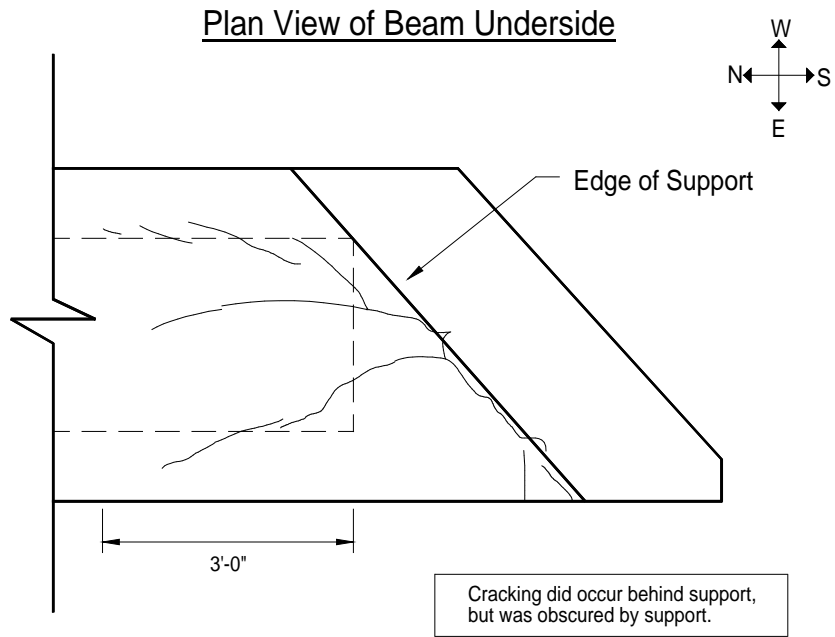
Pretest Cracking in Bottom Flange of Box Beam 3 - Test 1
